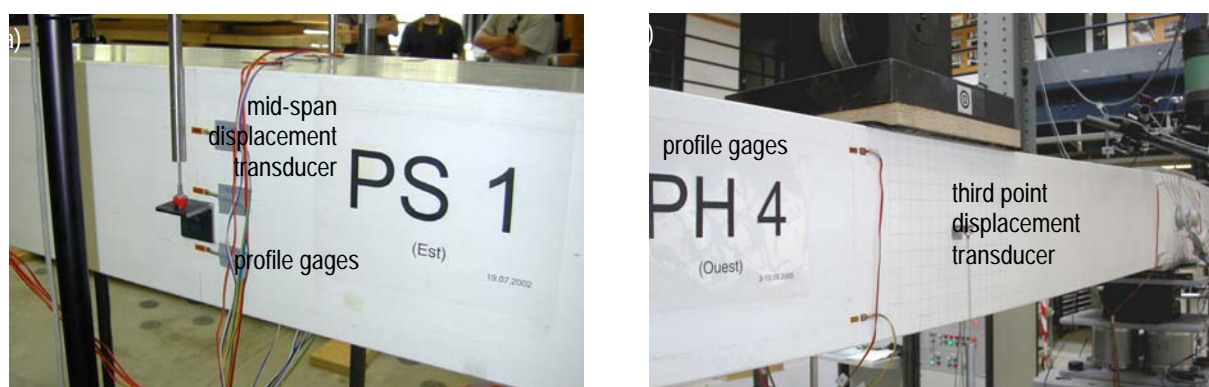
(a) Mid-span section of beam PS1; (b) Loading section of beam PH4
